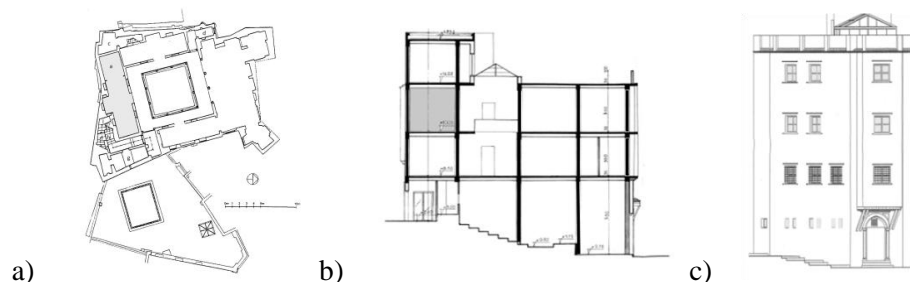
(a) 2nd floor plan (b) Section (c) Elevation.
